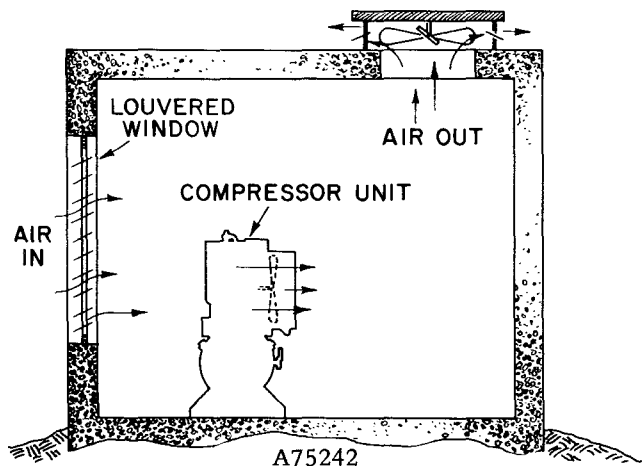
COMPRESSOR ENCLOSURE
